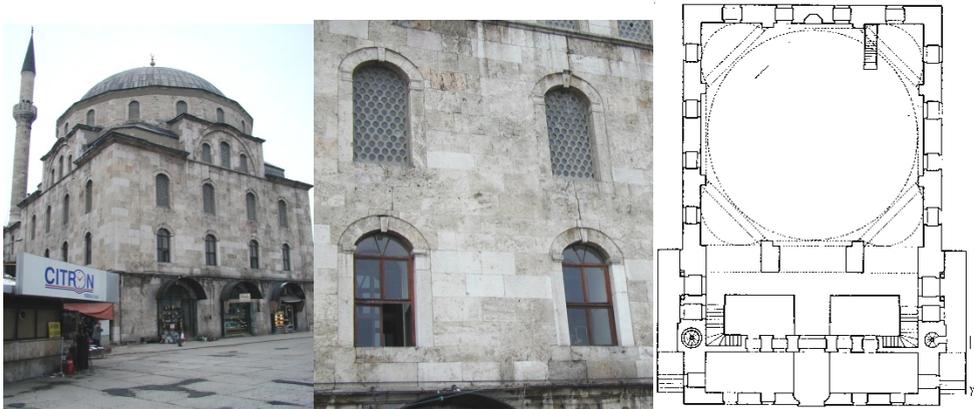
Wall damage and plan view of historical Yildirim Bayezid mosque in Bolu
